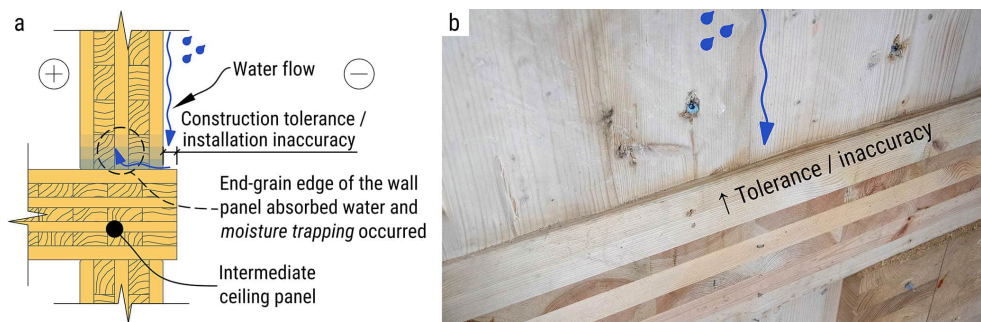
CLT floor and wall panel connection joint (a) where the protruding floor panel (b) facilitated water ingress to the wall panel. Photo b is from building A.
